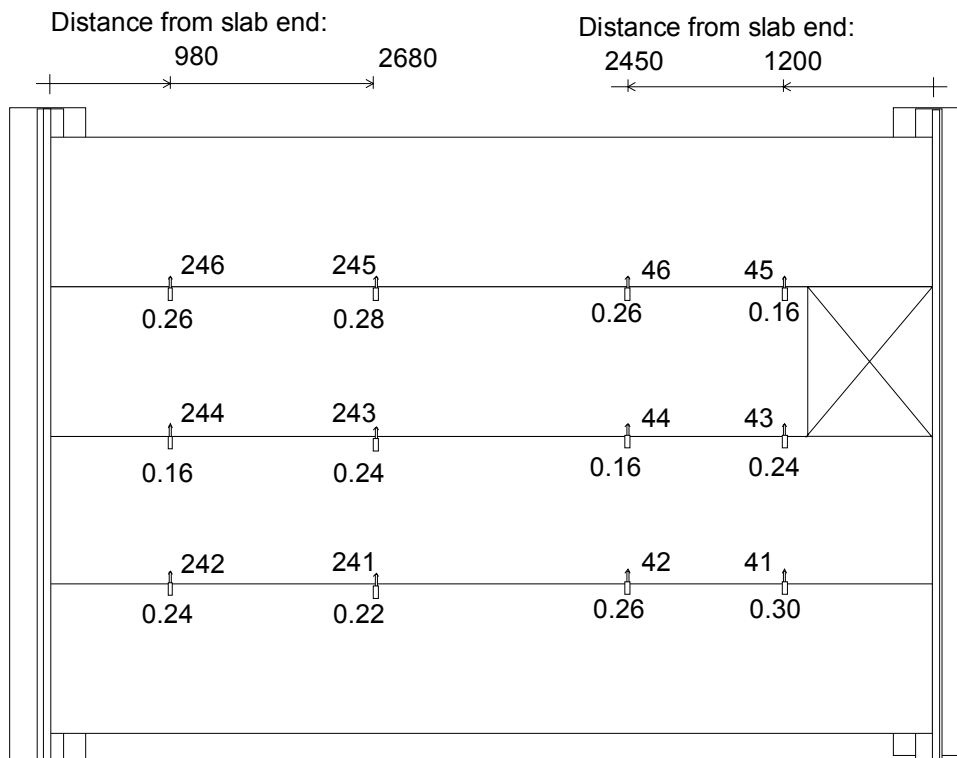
Crack width due to precracking. For the location of transducers see Figs 16 and 18.
